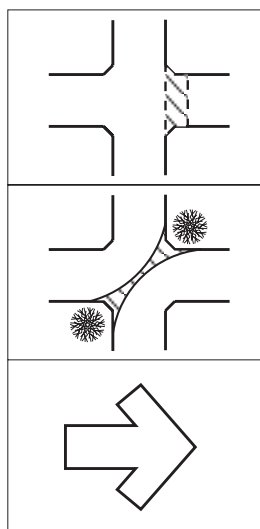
Roadway adaptations to manage traffic volumes.
